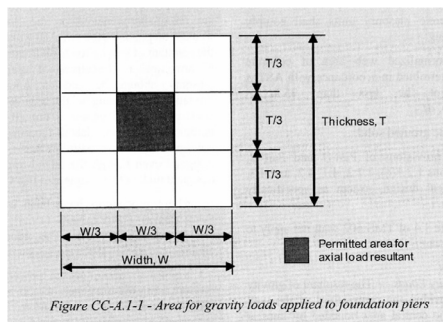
Area for gravity loads applied to foundation piers
